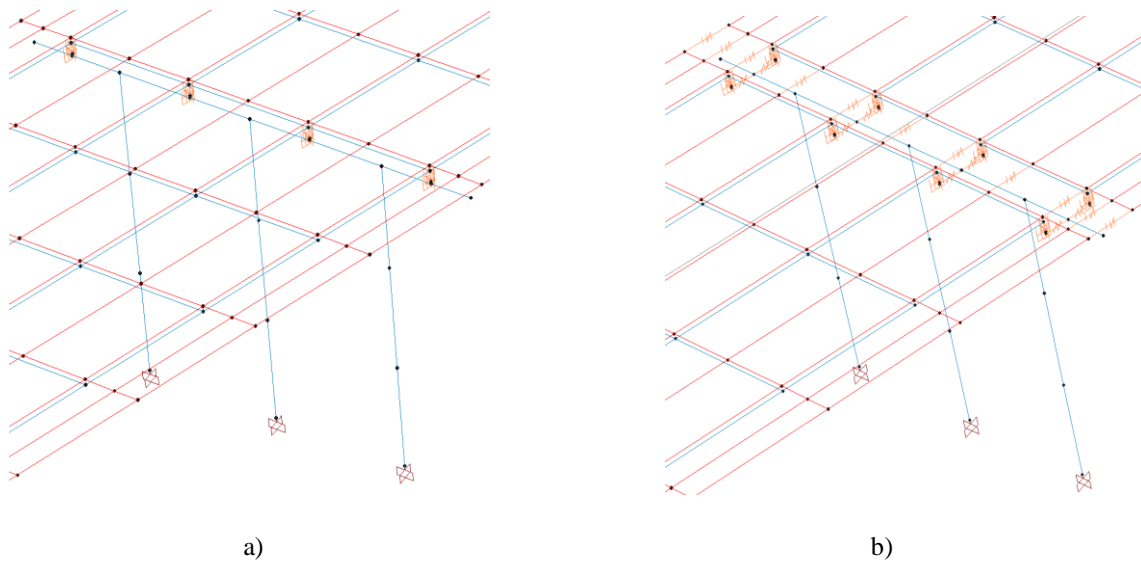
Model of bent cap a) without deck gap element b) with deck gap element
